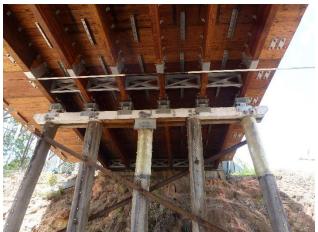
Boundary Road Bridge is a four-span overpass crossing a pair of Queensland Rail tracks. The light weight of the timber superstructure allowed each span to be preassembled along-side the road and lifted into place by crane. This limited the interruptions to rail traffic on the tracks below.
